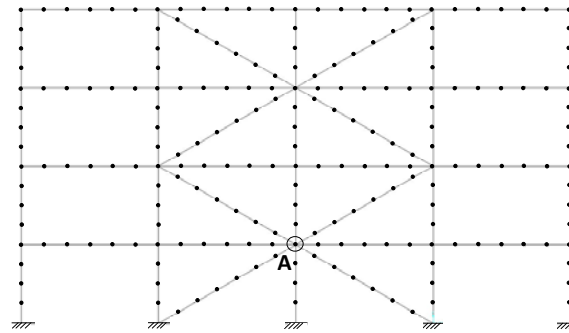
Finite Element Model of Structural Plane Frame in SAP2000 and its Associated Nodes and Elements
